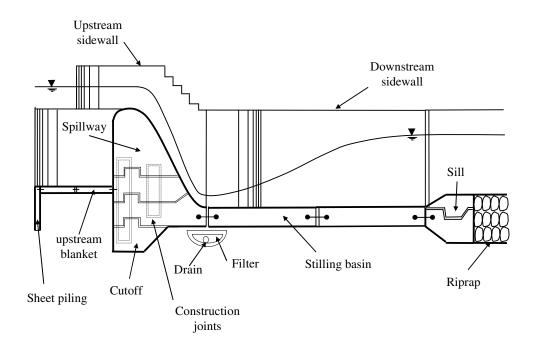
Longitudinal profile of a typical spillway and stilling basin.
